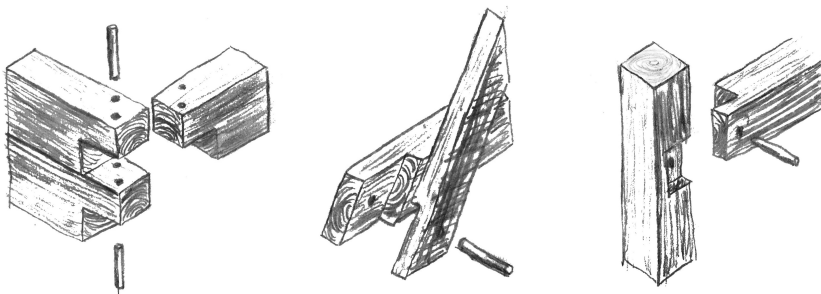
Nodal connections for a truss structure in wood inspired from timber trusses used in medieval church buildings as depicted in [104]. Sketch by the author.
